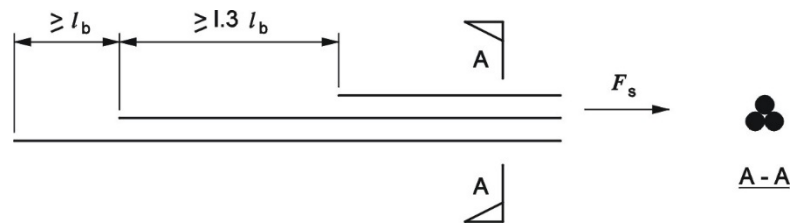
Anchorage of widely staggered bars in a bundle
